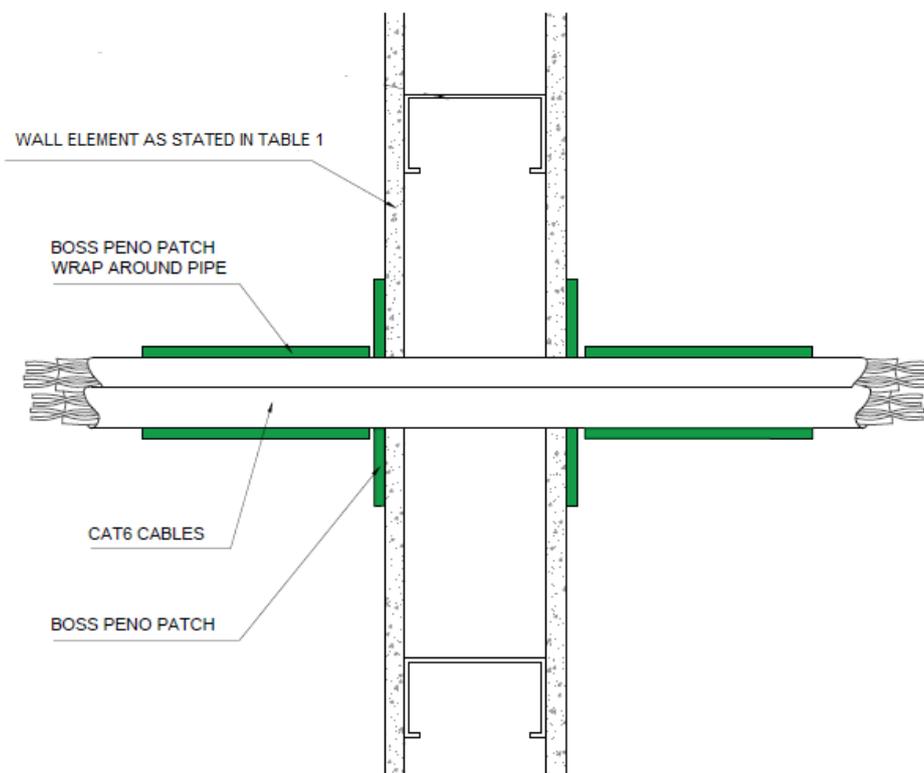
CAT6 cable bundle (up to 3 cables) penetration
